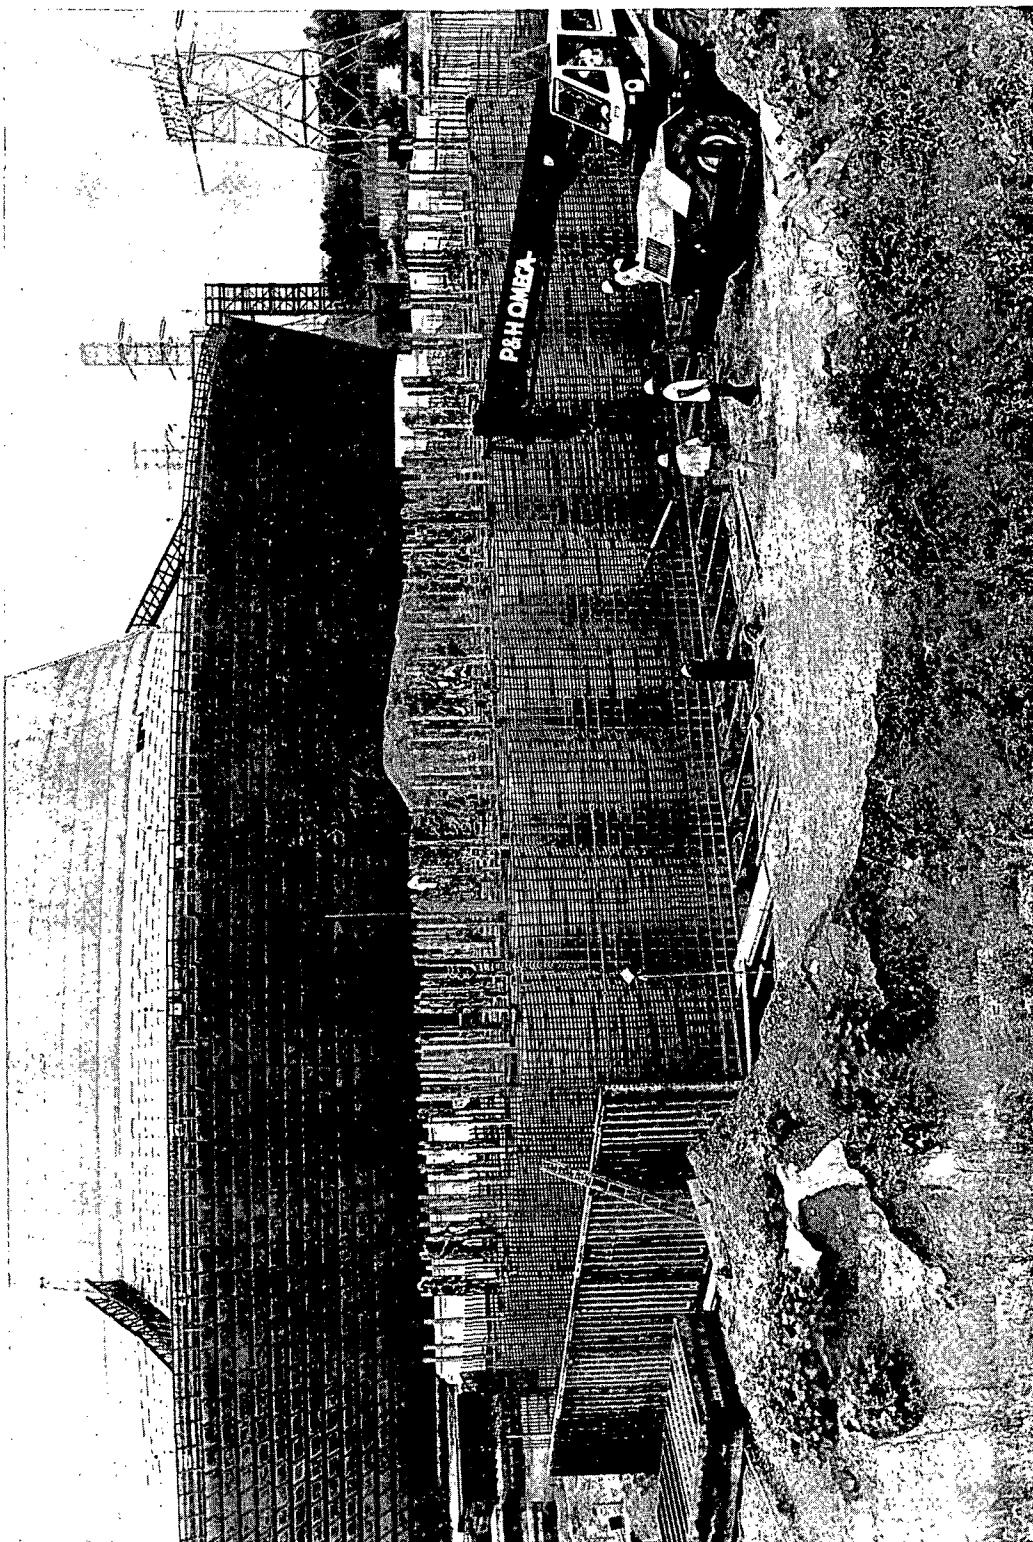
Construction of Interim Radwaste Storage Facility at TMI. Two storage modules are now completed, with individual silos surrounded by reinforced concrete. (Official TMI Photo)
